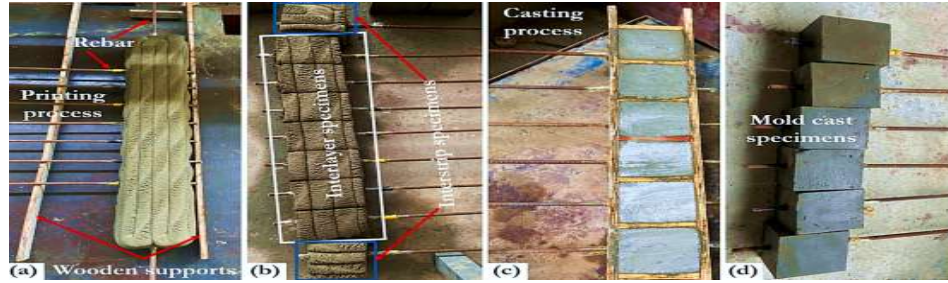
Printing and casting of specimens: (a) 3D printing and rebar placing process; (b) 3D-printed specimens; (c) casting of mold cast specimens; and (d) mold-cast specimens. [11]
